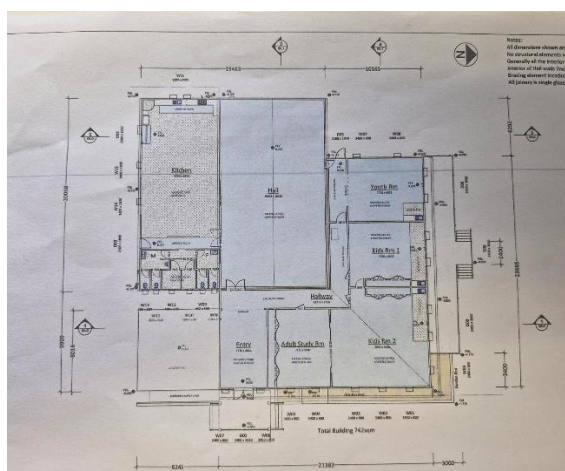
Floor Plan (Source: Coppermine CAD Services Ltd)
